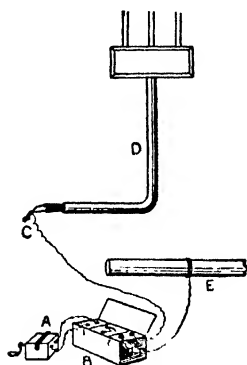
Testing Insulation Resistance of the whole of the Wiring.
